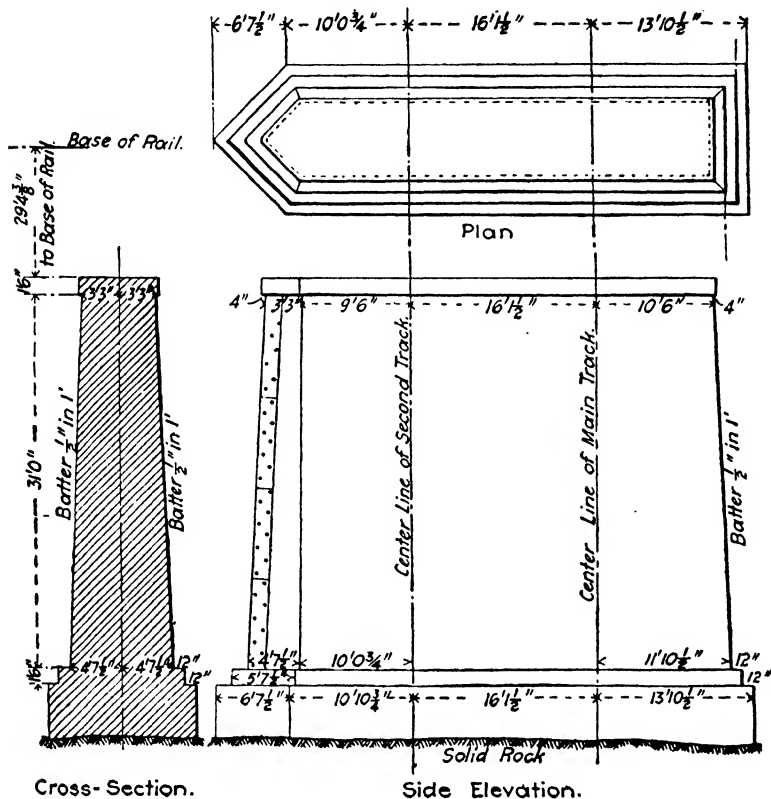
Concrete Bridge Pier, Fourth Crossing of Potomac River, Western Maryland Railway.
